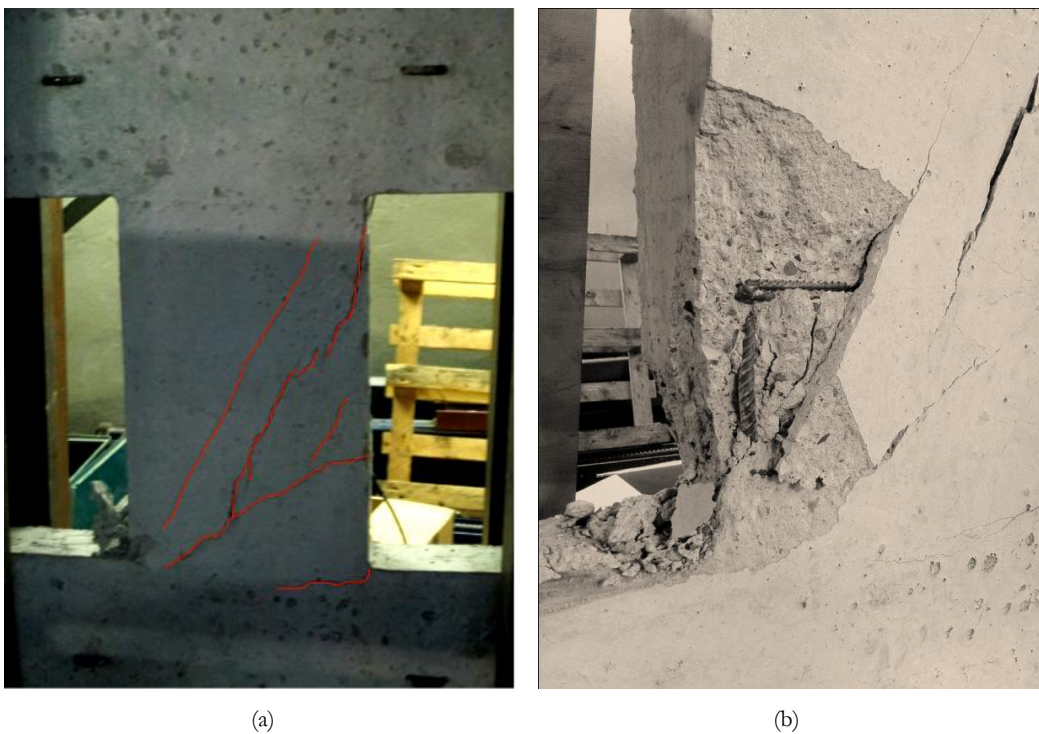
Coupling beams with complete reinforcement under monotonic loading: (a) crack evolution and (b) failure of the specimen
